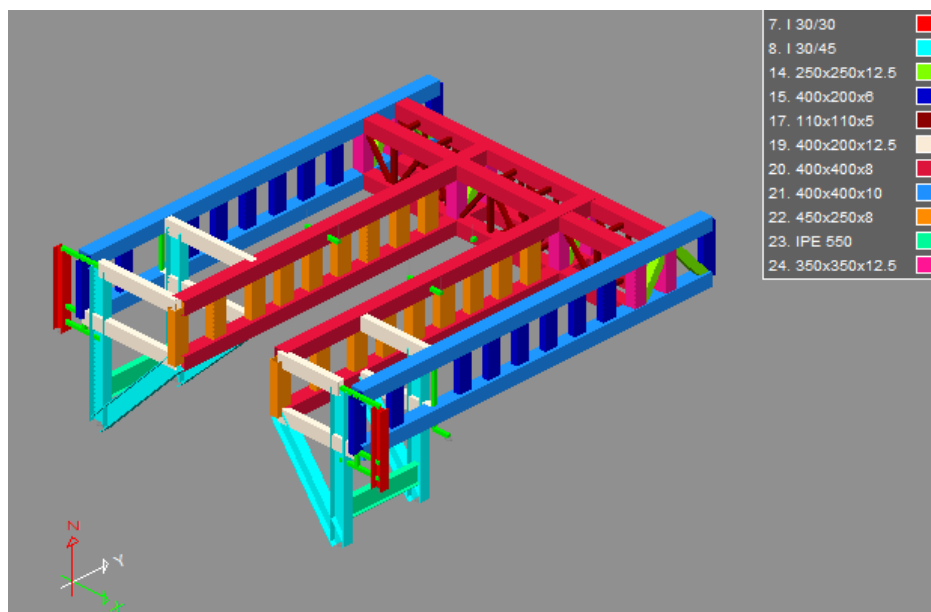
Solution 7 - 3D view and cross-sectional dimensions
